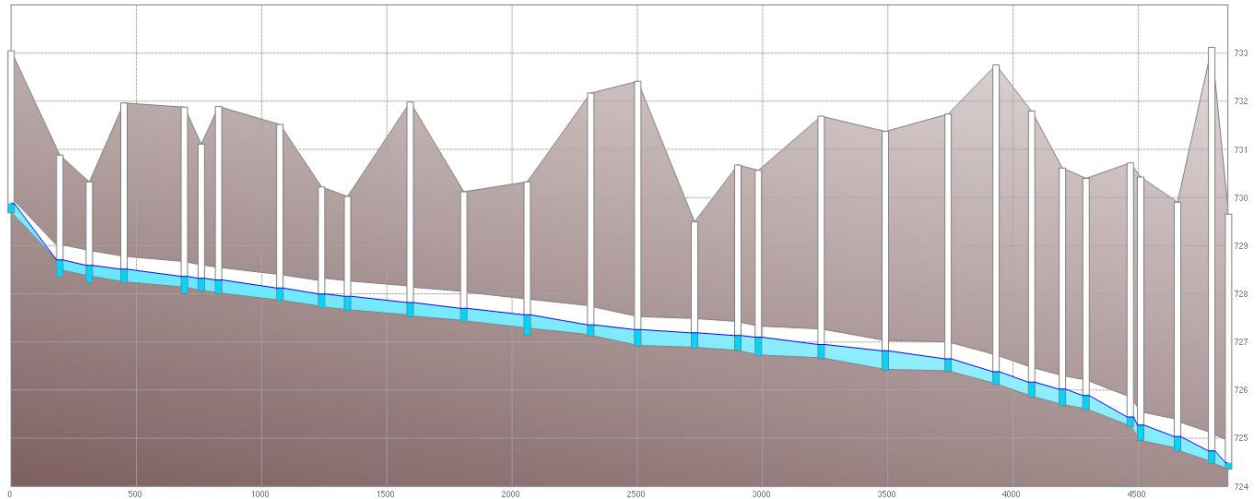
Stoney Creek Trunk HGL, Stage 2 0% Developed / Stage 3 0% Developed, from Stage 2 connection to 48 Ave – 25-yr 1-hr AES Design Storm
